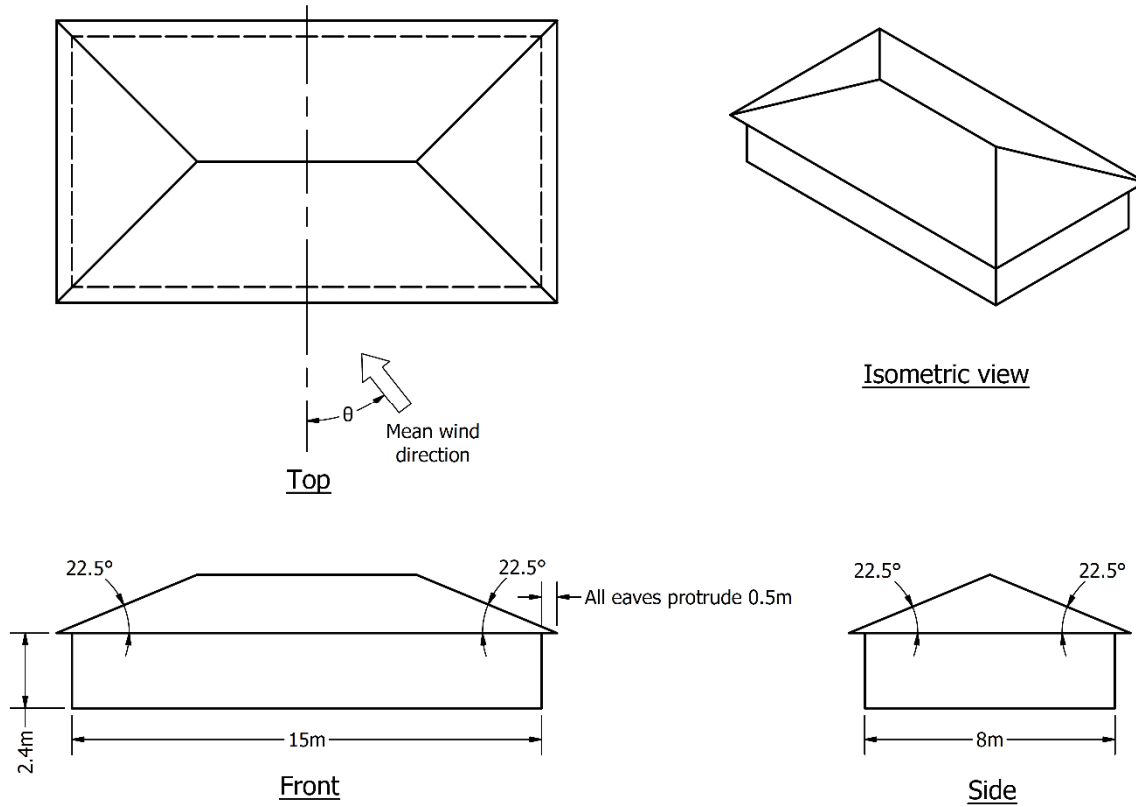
Building geometry, around which the sprinkler configurations were simulated.
